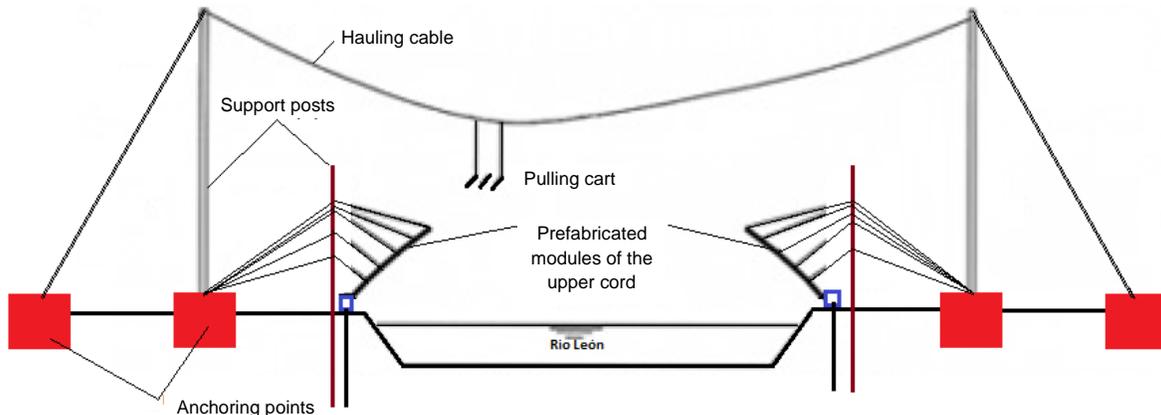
Longitudinal elevation assembly of elements that make up the arch
